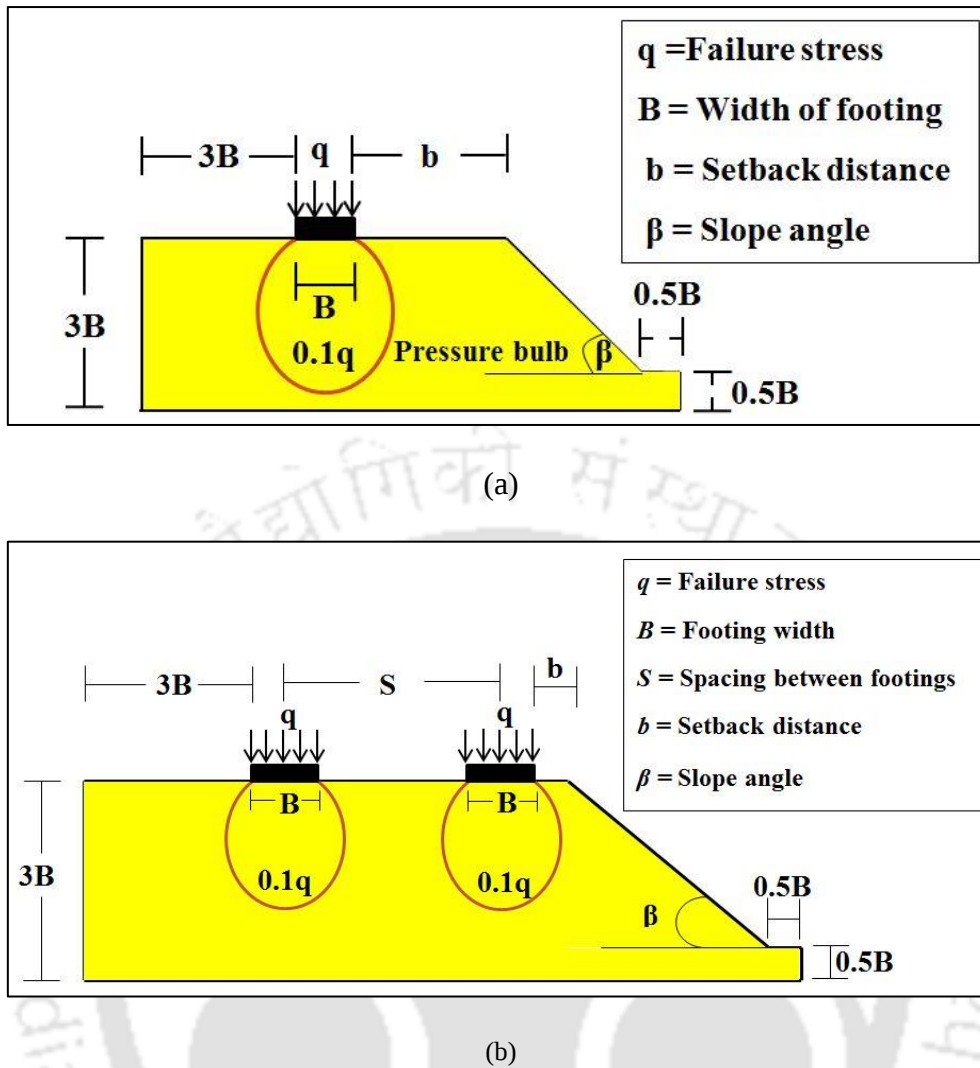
(a) Typical model diagram of isolated strip footing placed near slope (not to scale); (b) Typical geometry for interfering strip footings located near slope (not to scale)
